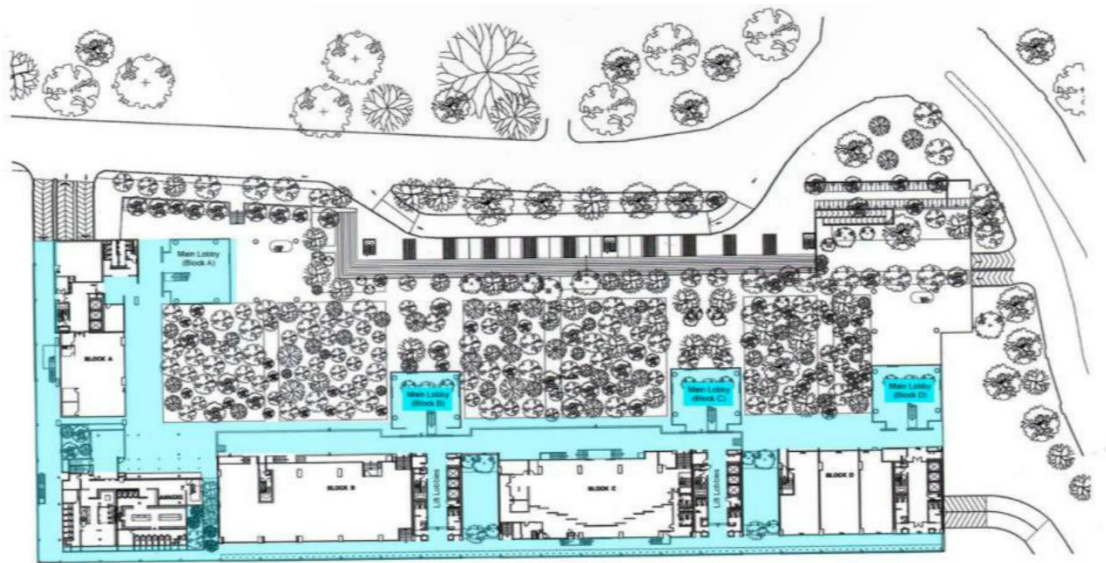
Shaded blue area shows the location of the open plan layout at PJ Trade Centre
